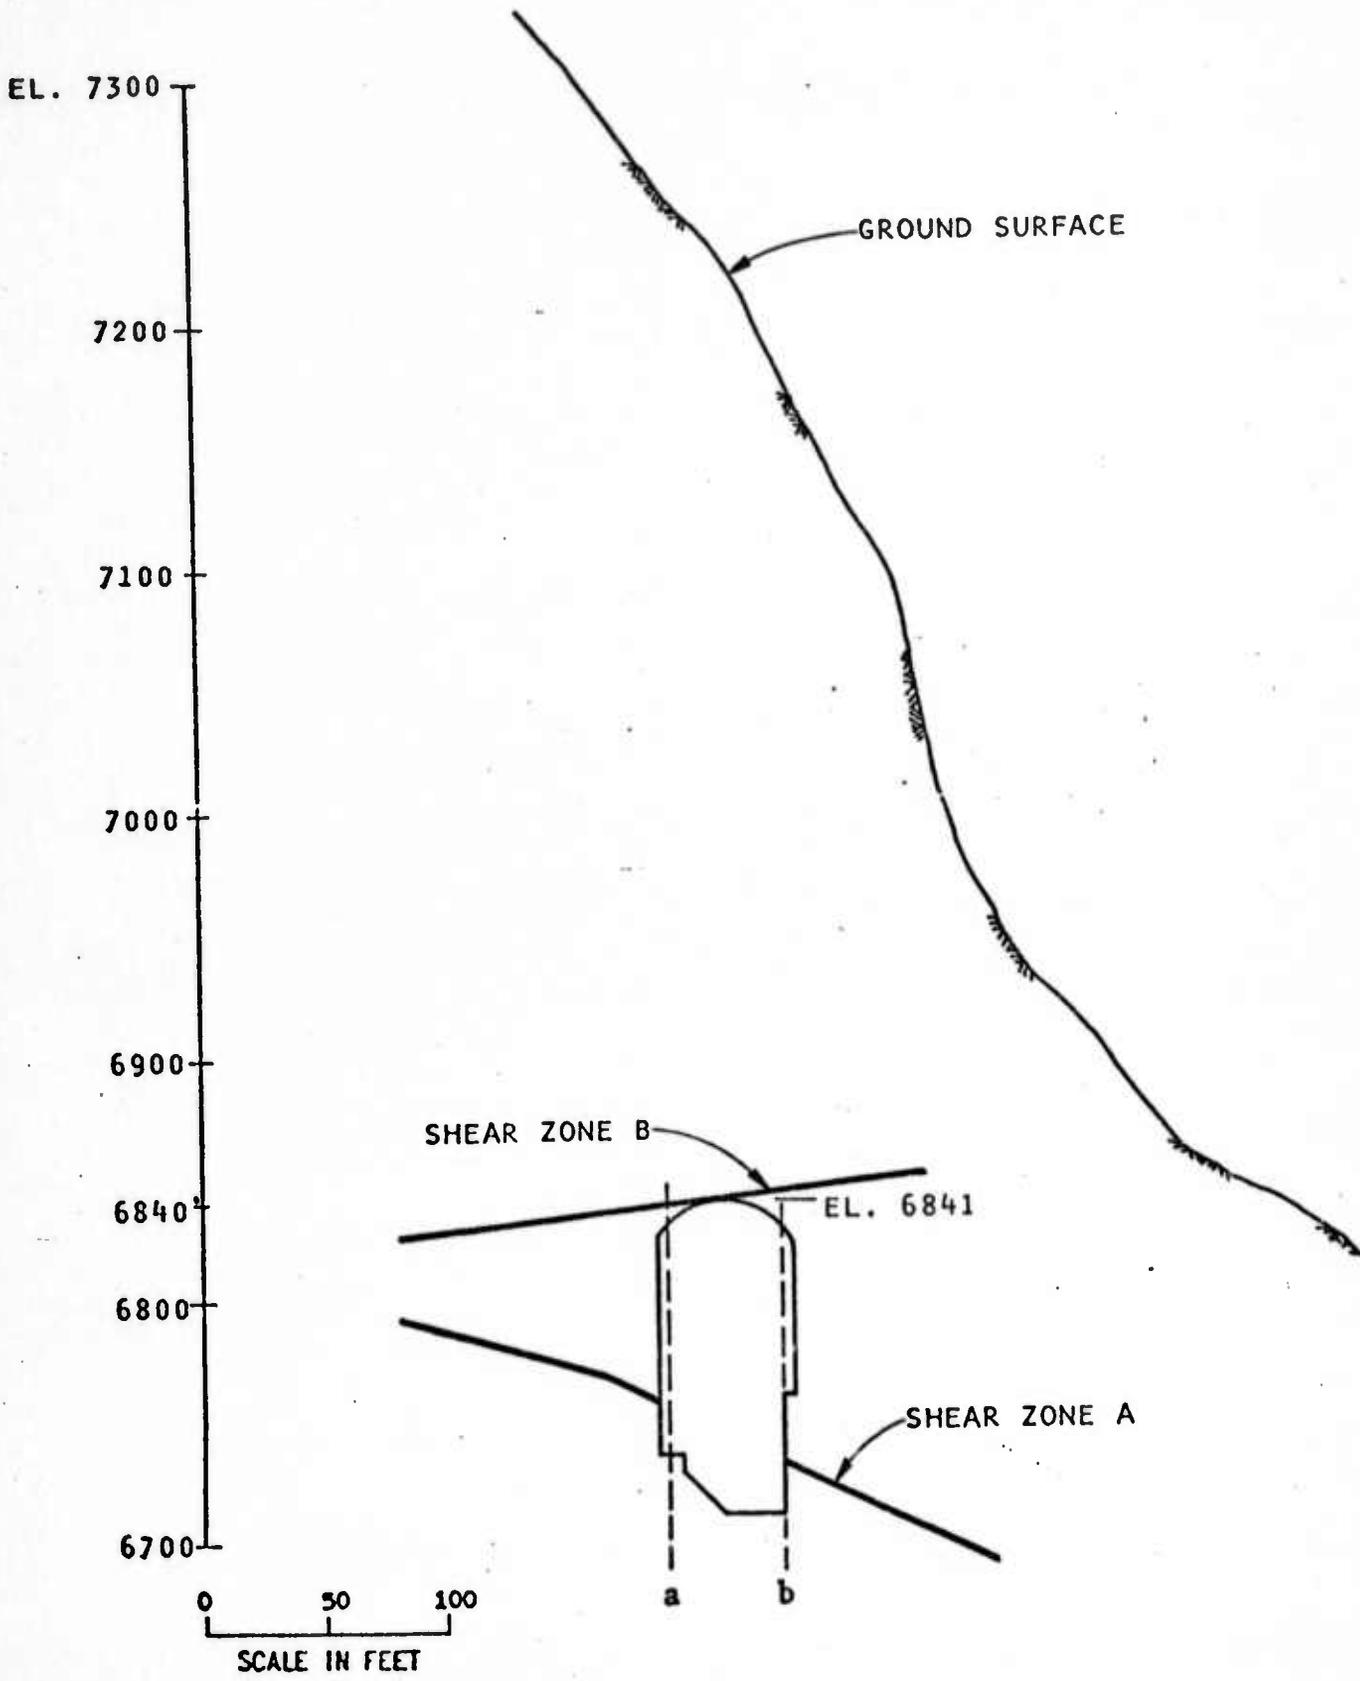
CROSS-SECTION A-A' (LINE 4 + 12 FT) OF THE POWERPLANT CHAMBER, MORROW POINT POWERPLANT
